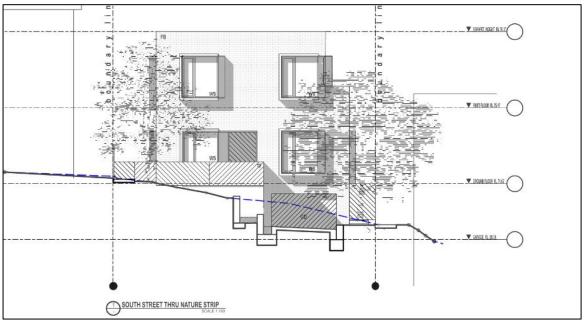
Approved development at 33 Douglas Street, Clovelly - DA/437/2024 (Source: Brian Van Der Plaat Studio).
